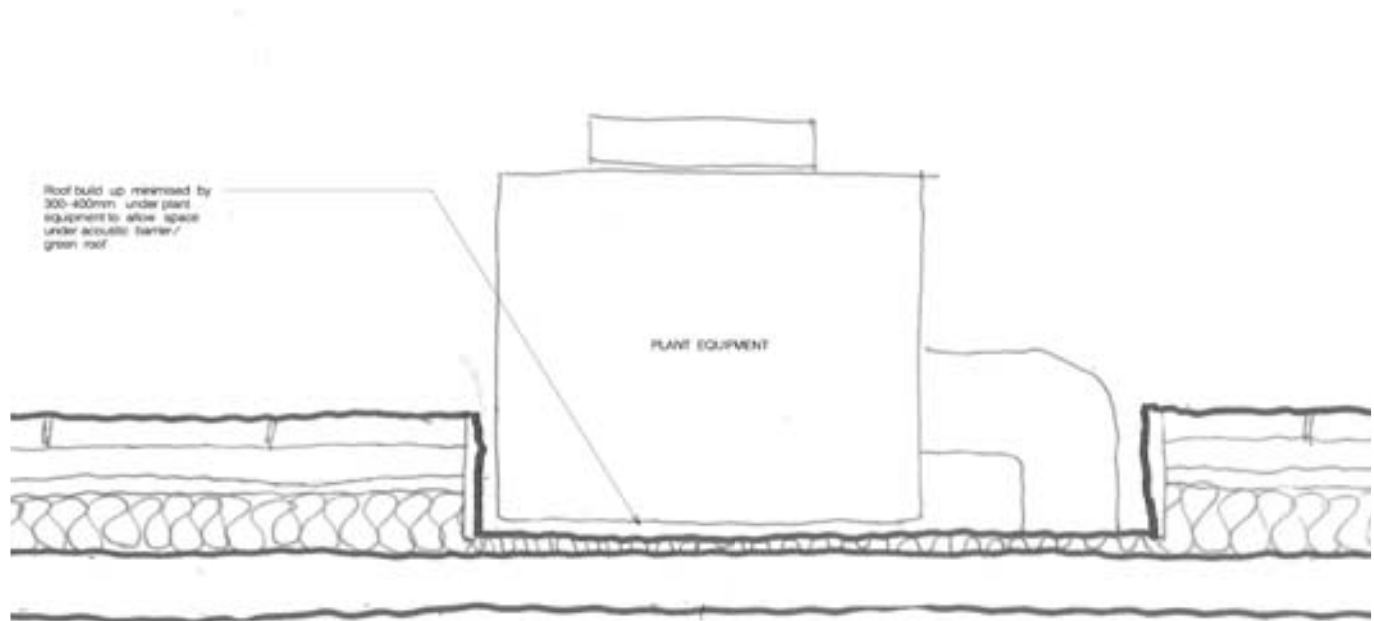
Sunken Flooring - flooring sunken in required areas to reduce the overall plant height.
